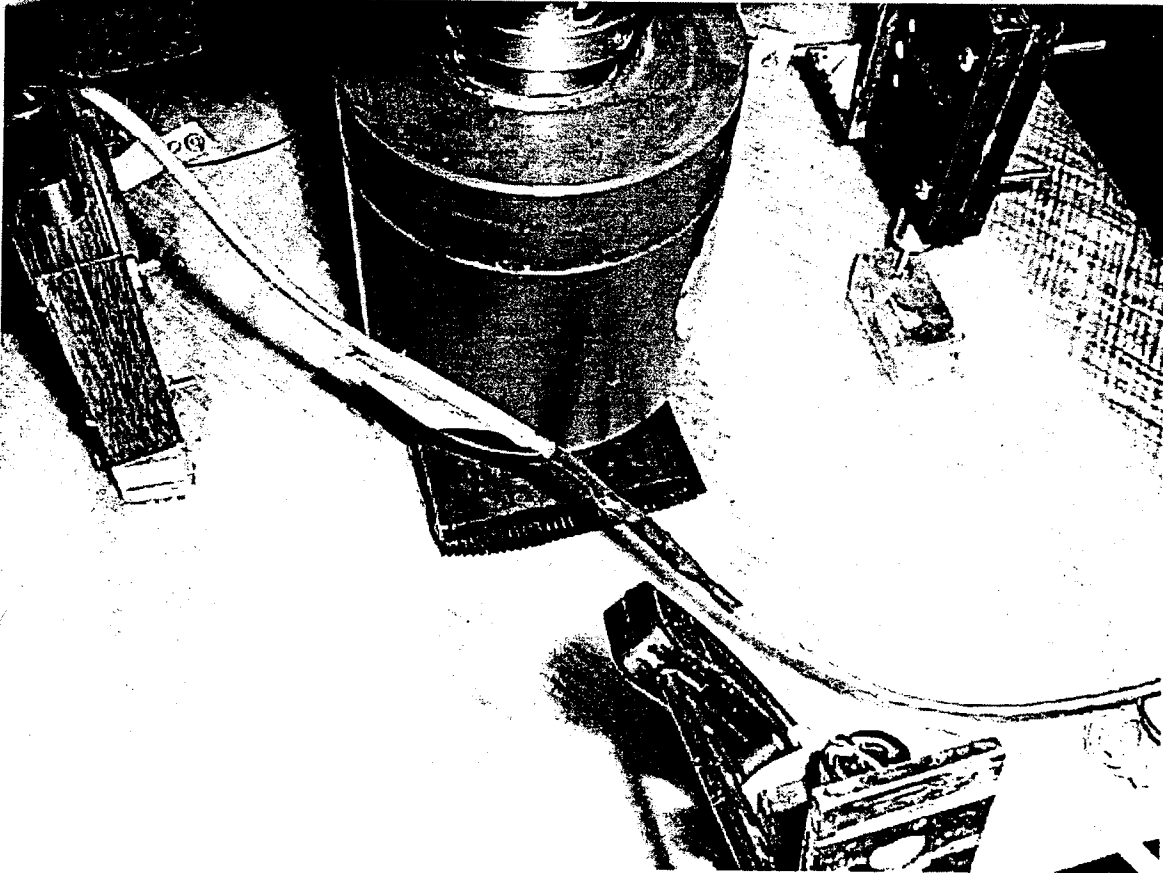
Initial cracking of the outer shell of bridge #1.
